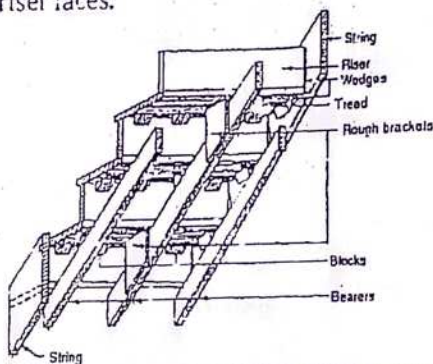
CONSTRUCTION OF A SIMPLE TIMBER STAIRCASE
